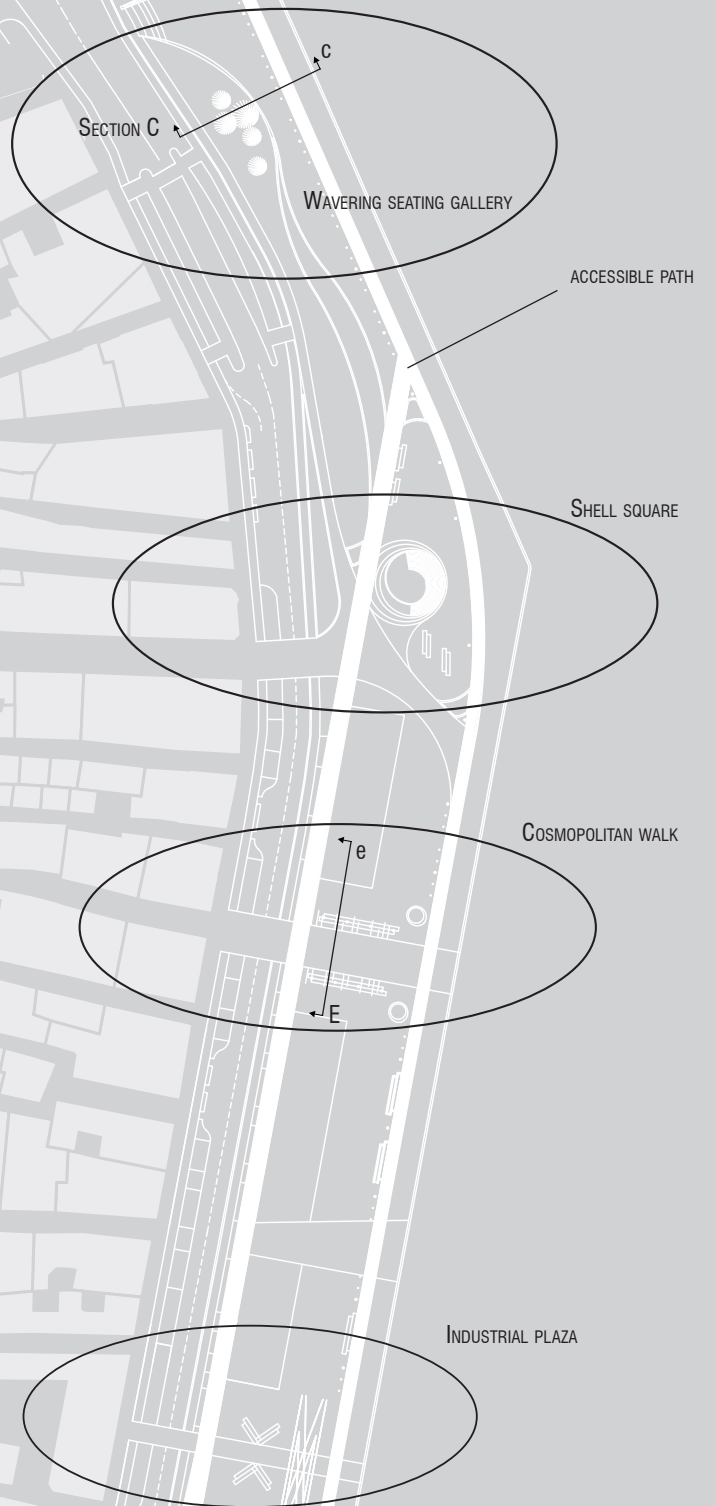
Accessible paths connecting the quay in to north/-southbound directions and new plazas formed.
